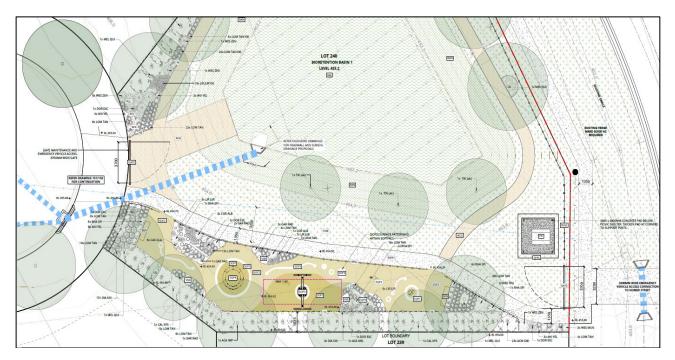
Proposed Detailed Design Plan for the Drainage Reserve and Playground (Submitted for the Subdivision Works Certificate & Section 138 Applications)
